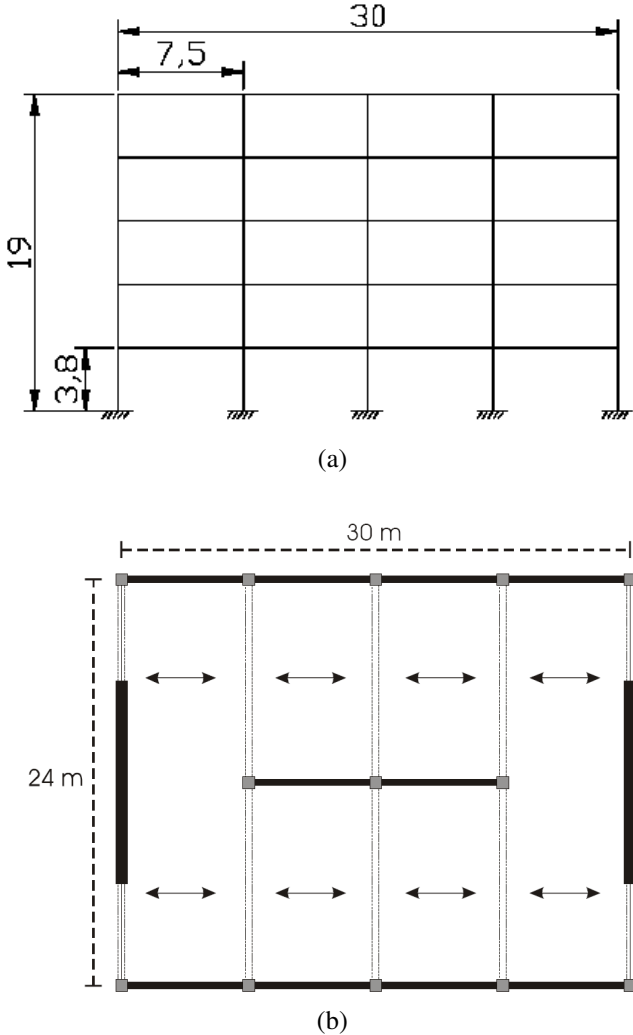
The simulated five-storey shear-type concrete building, (a) front view and (b) plan view
